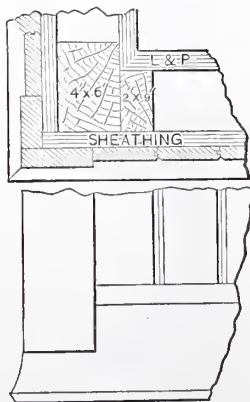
Elevation and Section at Line of Water-Sill.—Scale, 1 Inch to the Foot.
